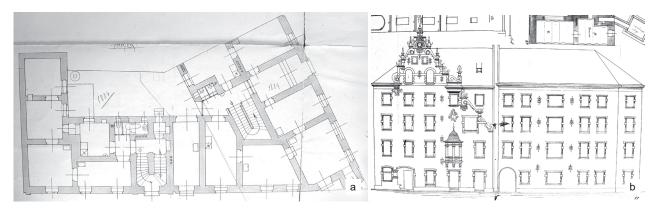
Krakow, townhouse at 35 Karmelicka Street / 28 Batorego Street (design by T. Talowski, 1887–1890): a) floor plan, b) façade (source: ANK, ABM Karmelicka 35, fsc. 361)
